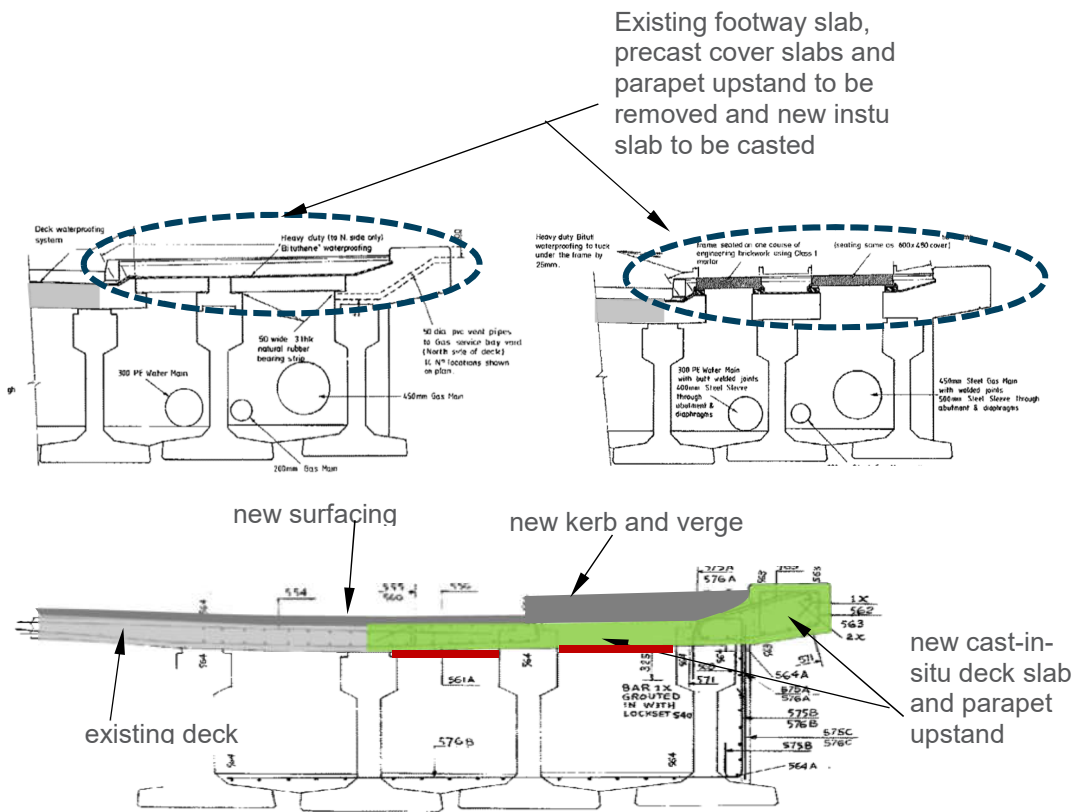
Proposed deck stitching using cast-in-situ concrete (Option 1)
